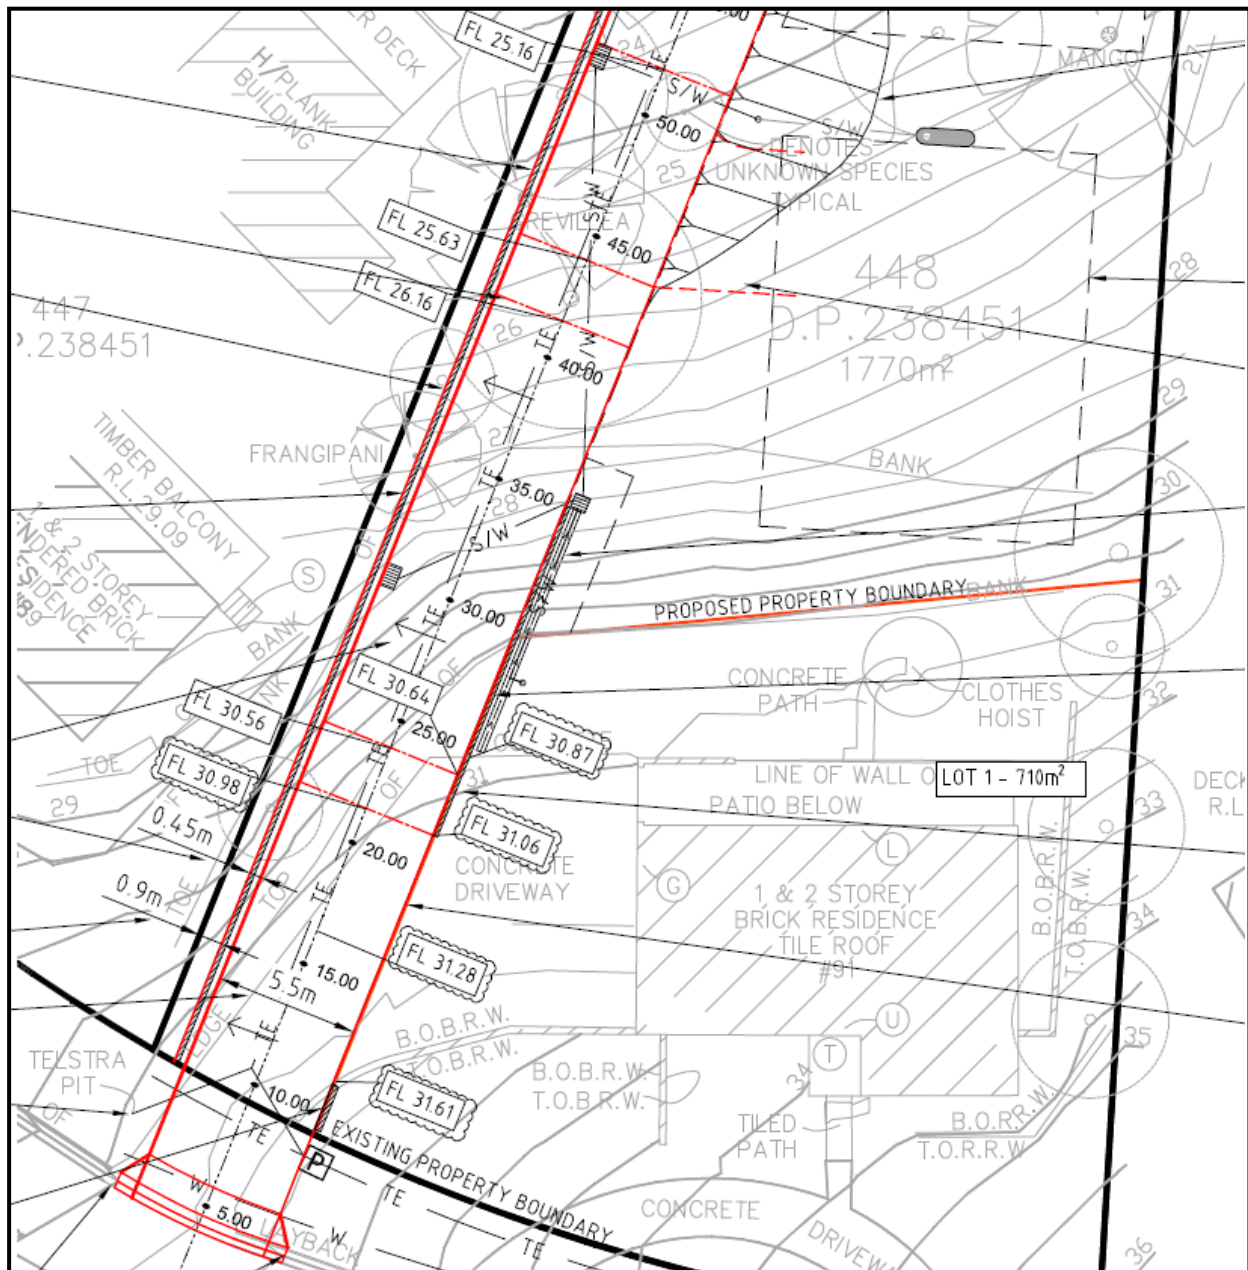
Proposed revised driveway setback 900mm from boundary from No.89 Orana Road
